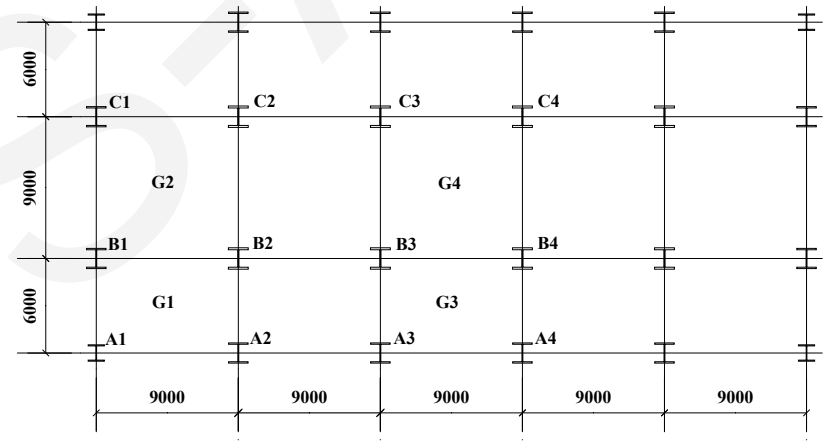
The structural plan arrangement of the steel frame model (Units: mm)
